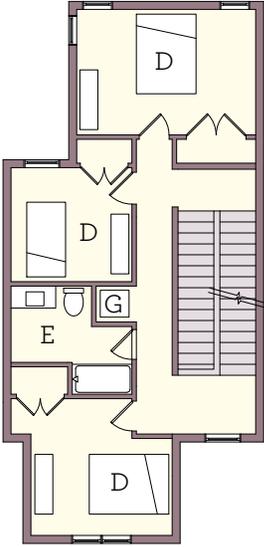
Sample plans of the Maple Knoll site: Townhouse
